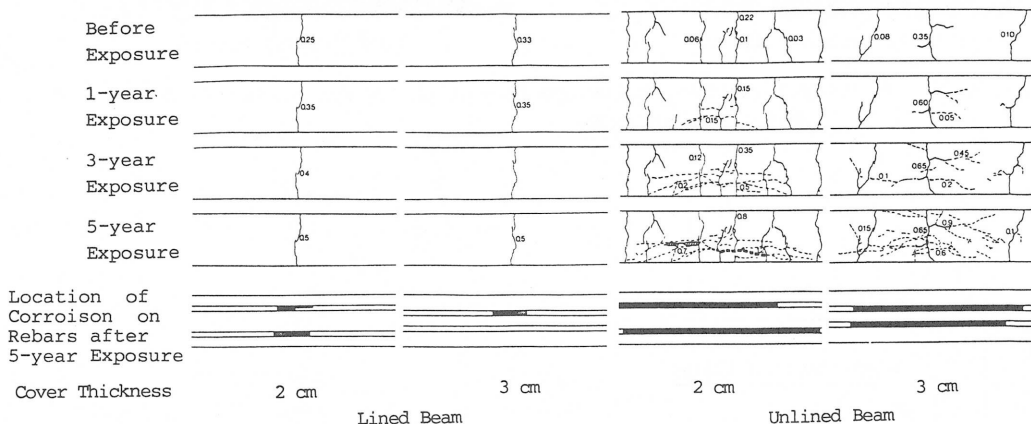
Cracks of Reinforced Concrete Beams and Location of Corrosion on Rebars.
